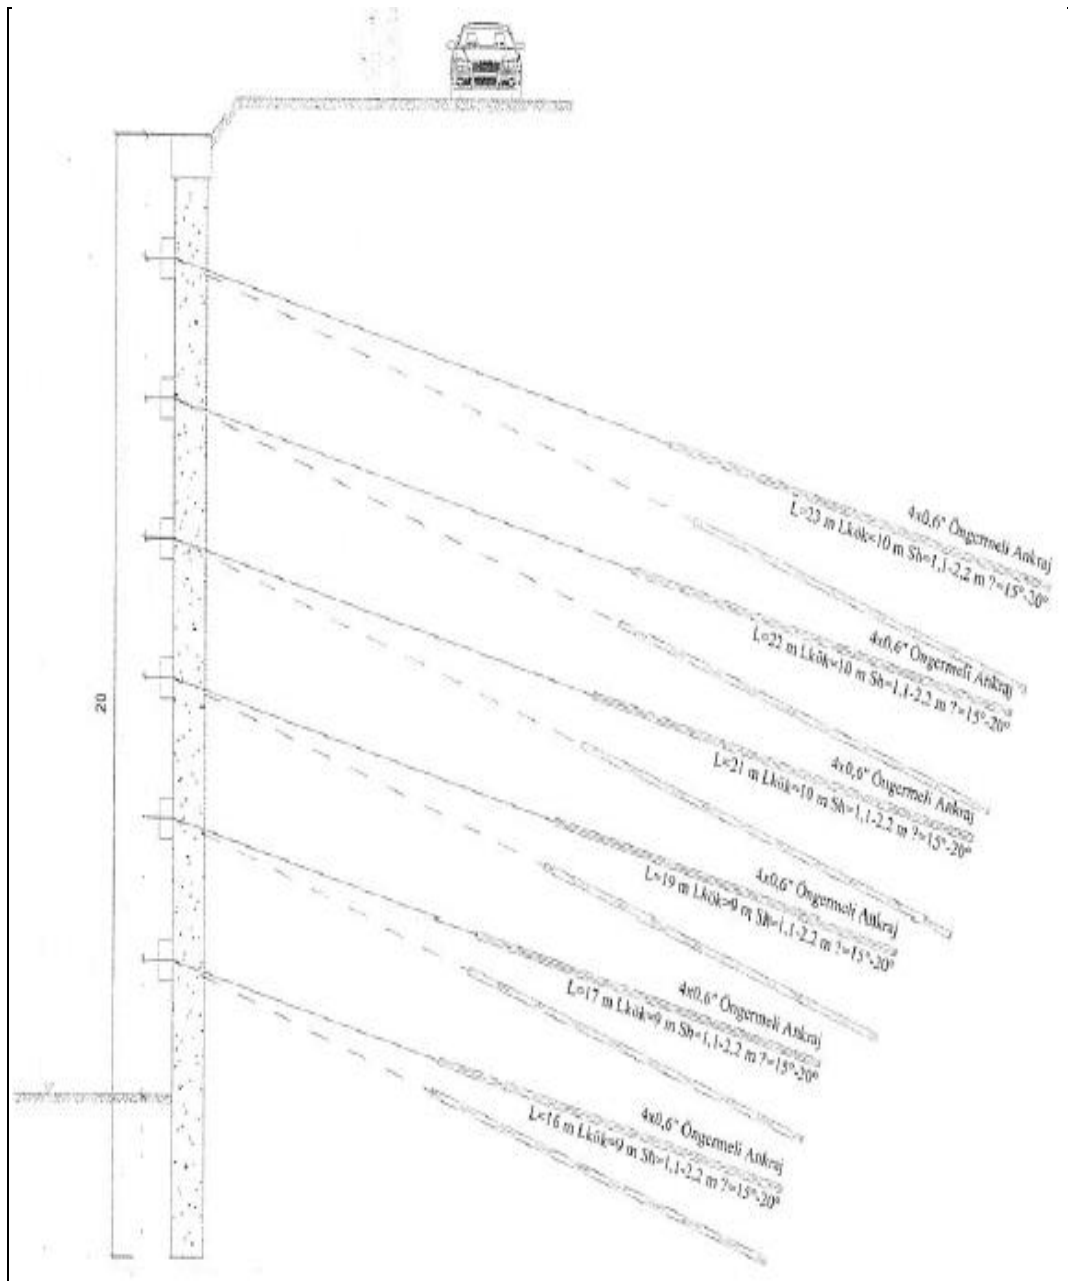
Cross-section of retaining wall and multi level anchors [109]
